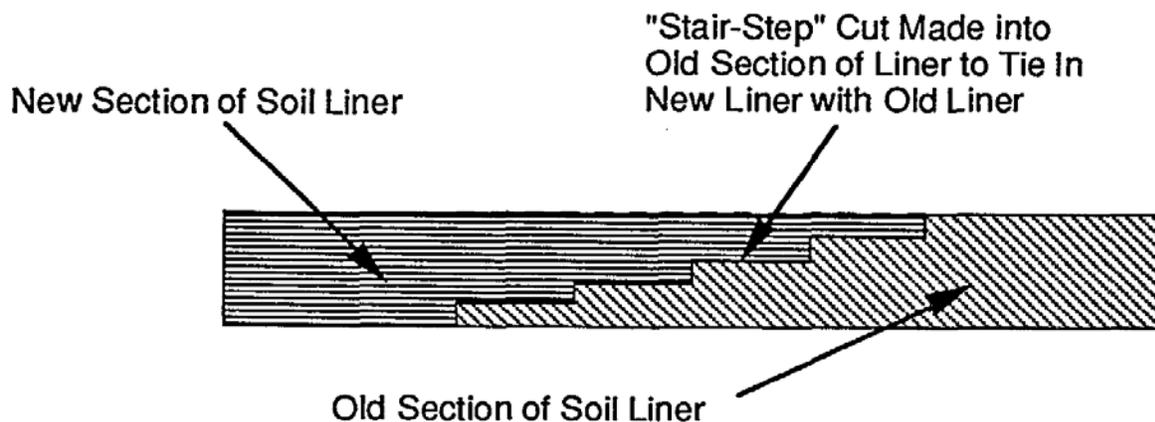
Constructed Soil Liner Stair-Step Tie-in Detail
